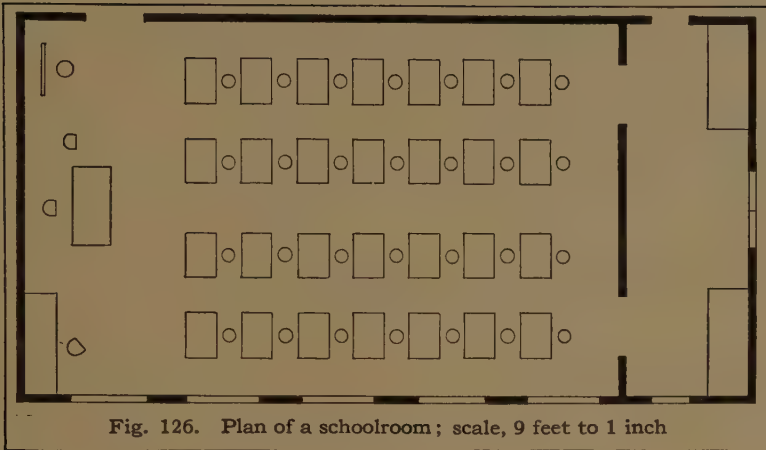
Plan of a schoolroom; scale, 9 feet to 1 inch
